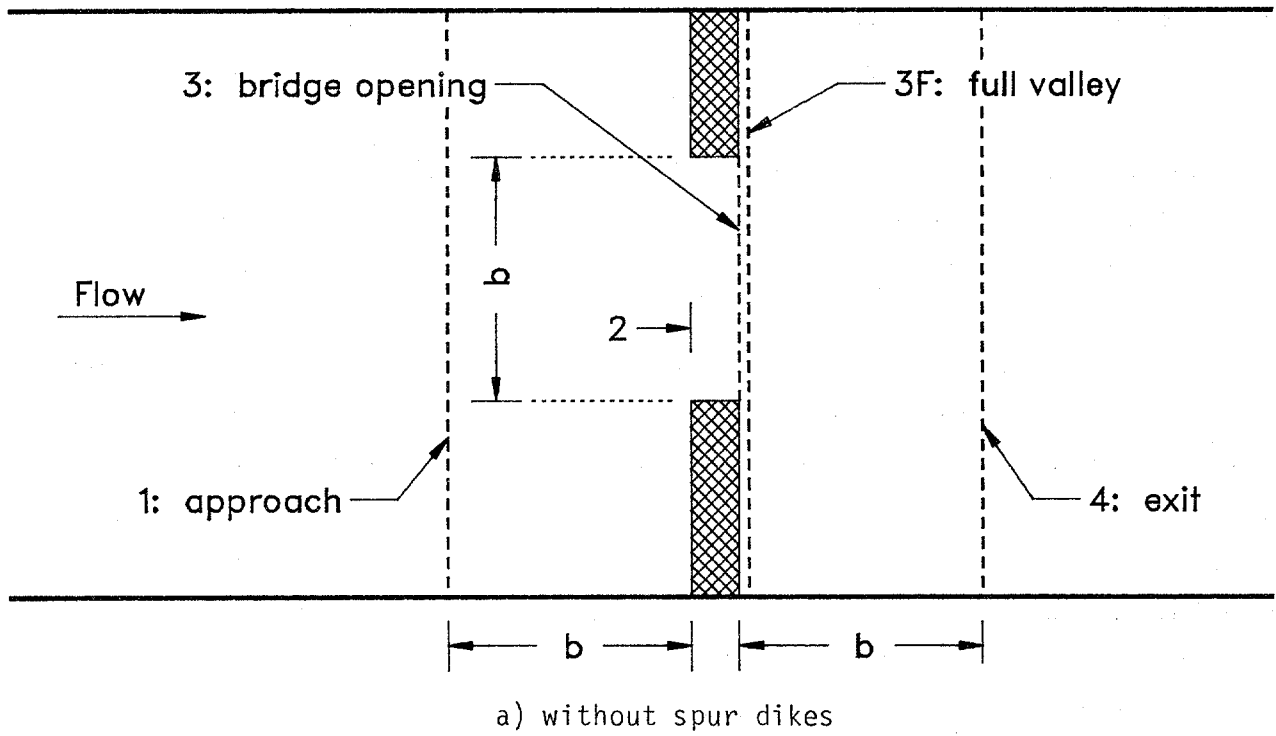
Cross-section locations for stream crossing with a single waterway opening.
